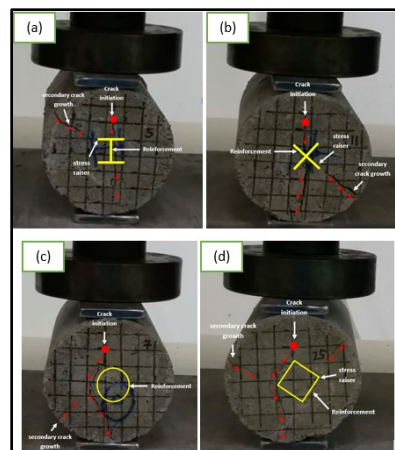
Failure pattern of concrete containing (a) I-beam; (b) X-shaped beam; (c) round tube and; (d) square tube rHDPE reinforcing structure
